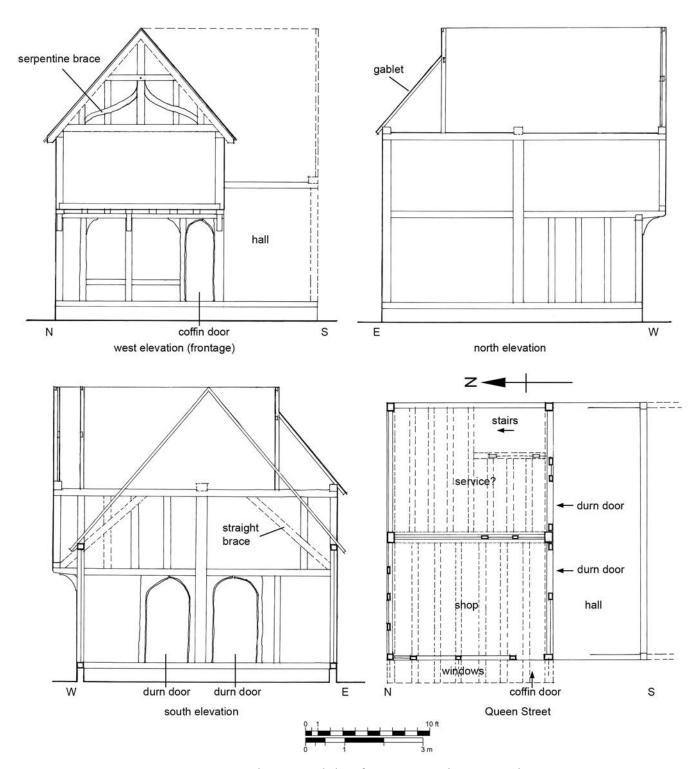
Elevations and plan of 7 Queen Street (corpus no. 82)
